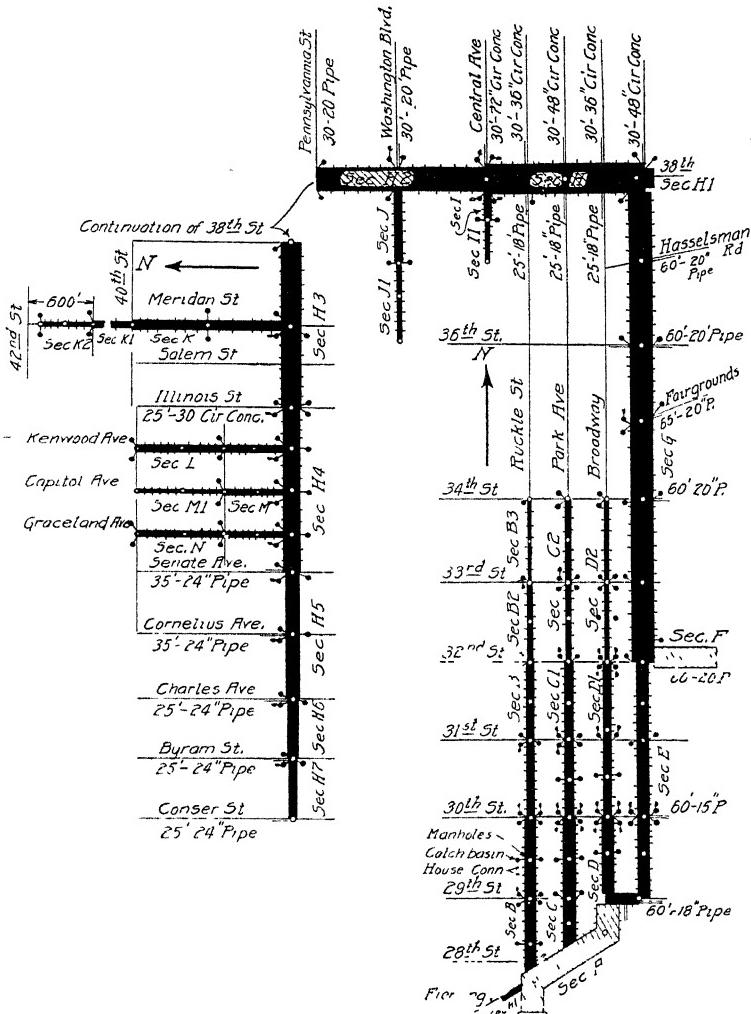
Layout for College Avenue Sewer Contract For Details of Section A See Fig. 10
